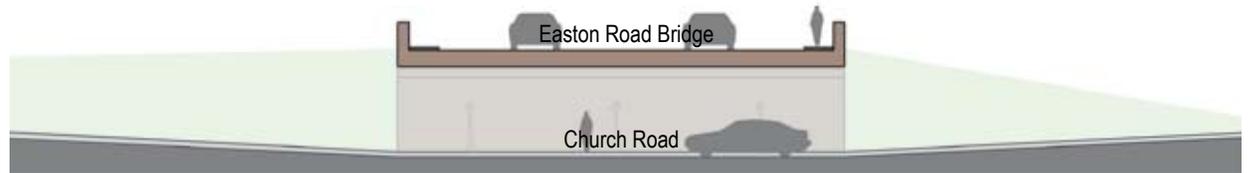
Church Road underpass alternate proposed walkway cross-section through Church Road looking south
